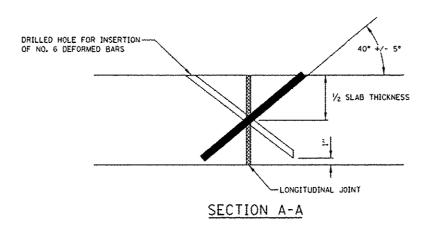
DETAIL H - LONGITUDINAL TIE BAR STITCHING FOR PRECAST PANELS
